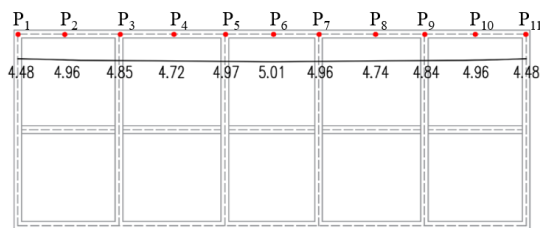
Settlement law of the ceiling of preliminary lining of the underpass through all-in-one excavation method /mm
